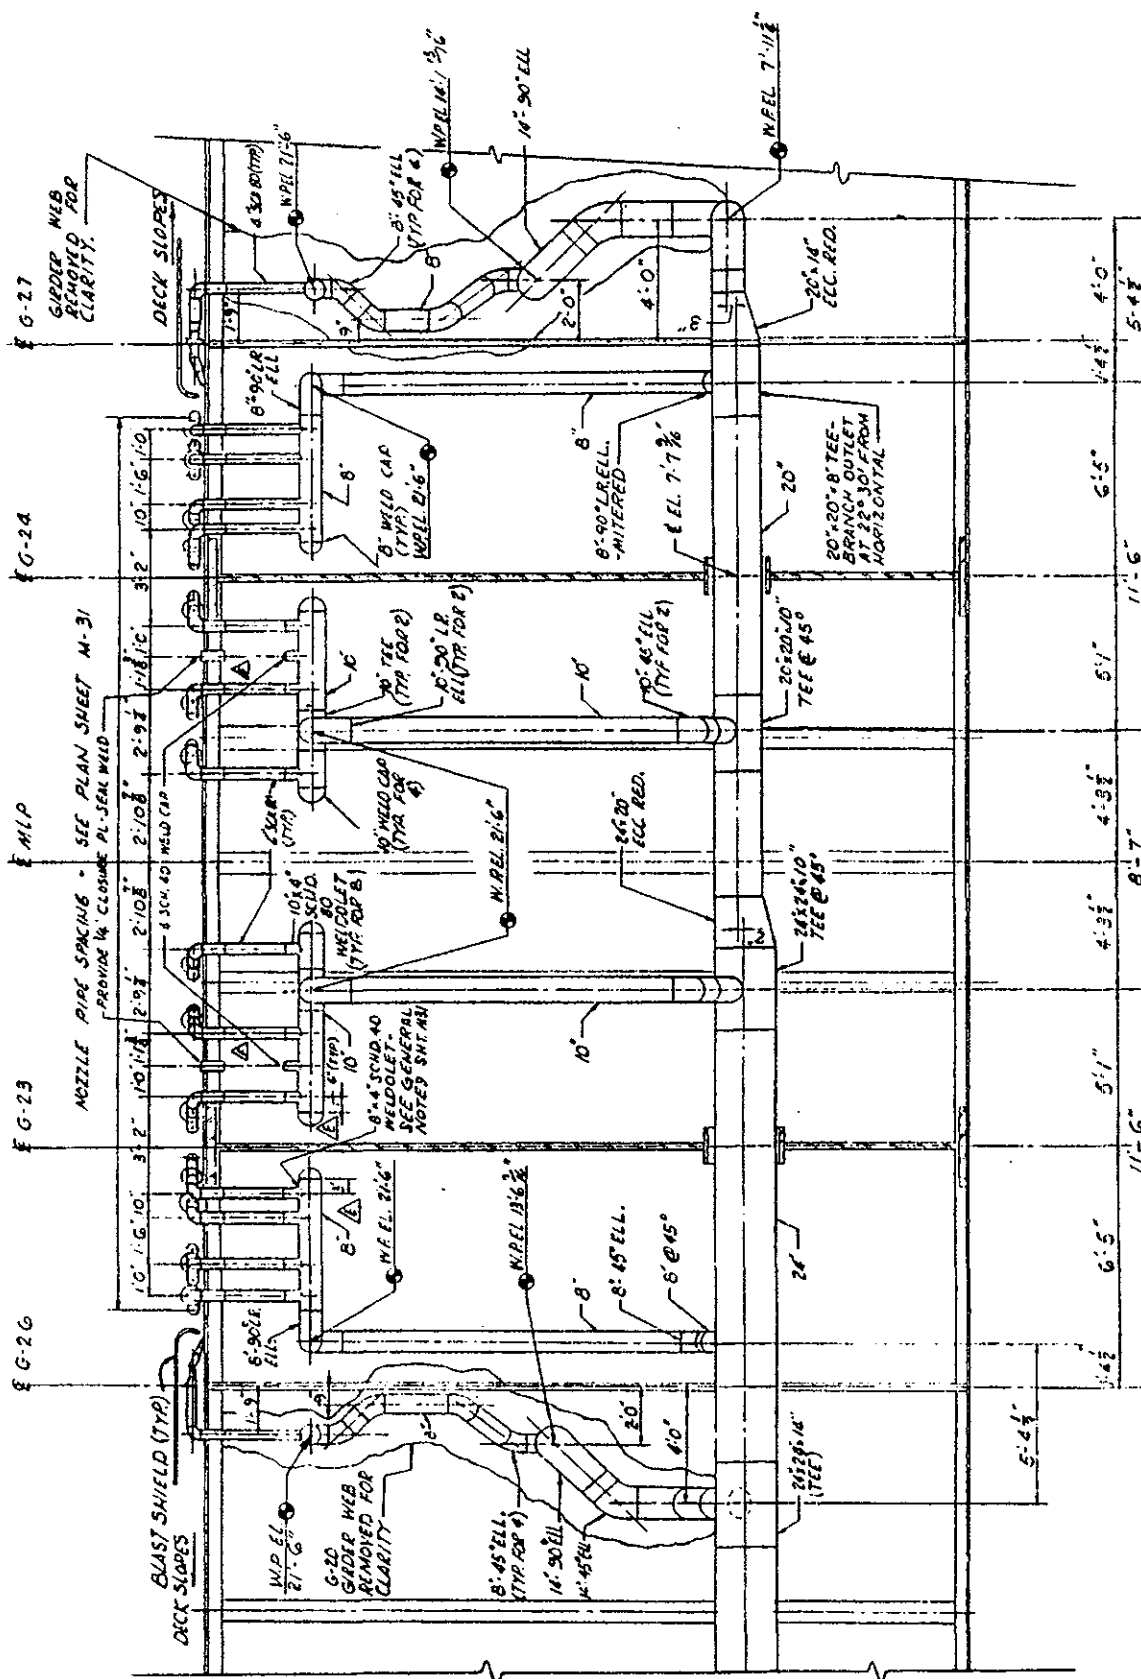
Example of Piping Drawing (Sheet 2 of 2)
